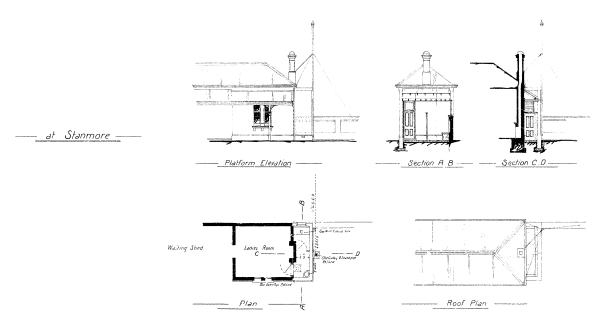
An undated, but likely c.1900, plan of the ladies' toilet extension of the Platform 3 building at Stanmore Station (Source: Sydney Trains Archives, 0053152 A0C)
